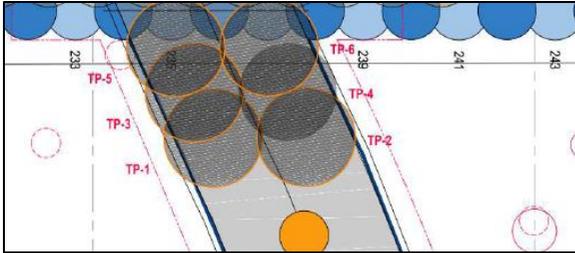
Plan view indicating supplementary jet grout column positions to complete stop-end seal within cooling water inlet tunnel
